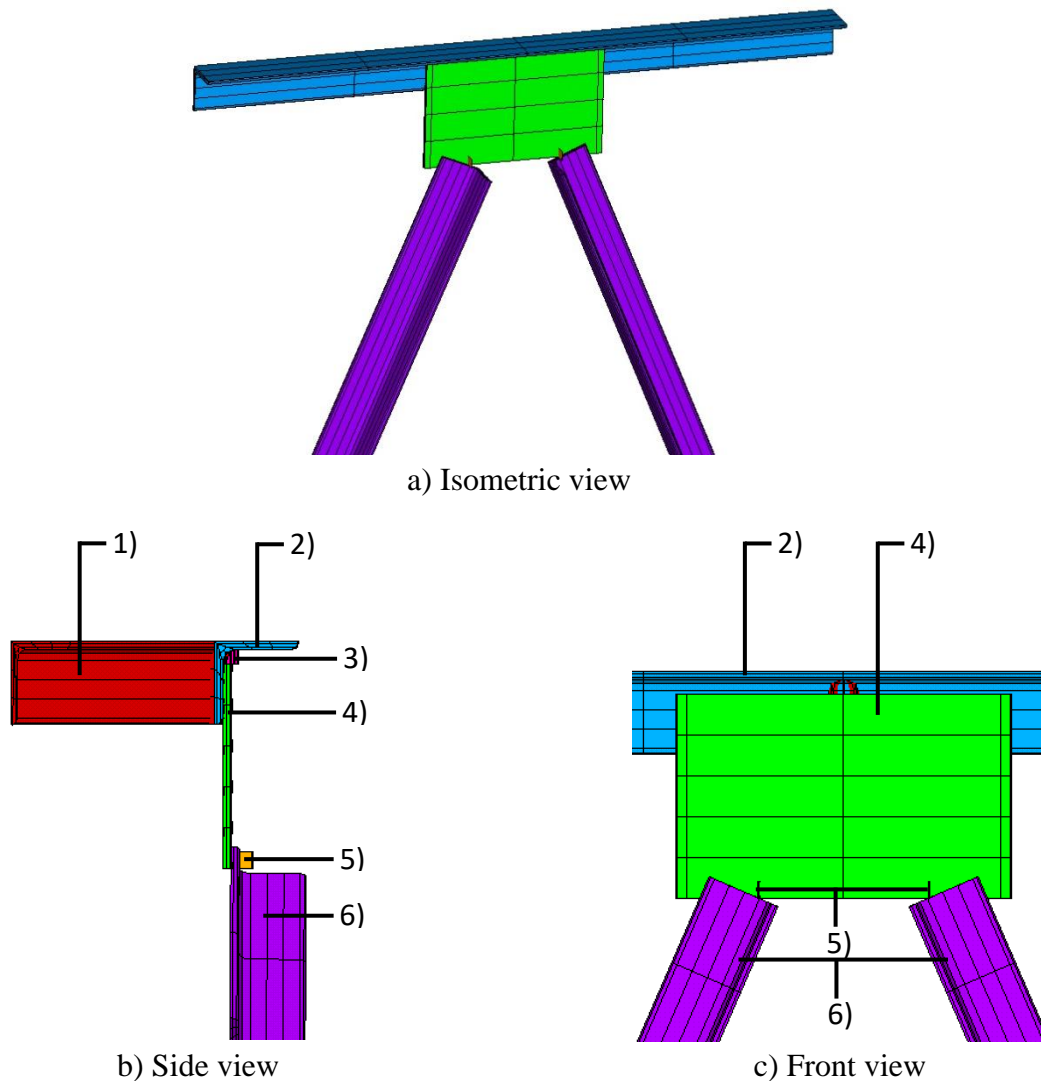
Tower model Level II approach – Detail of connection between vertical bracing and leg at base level
